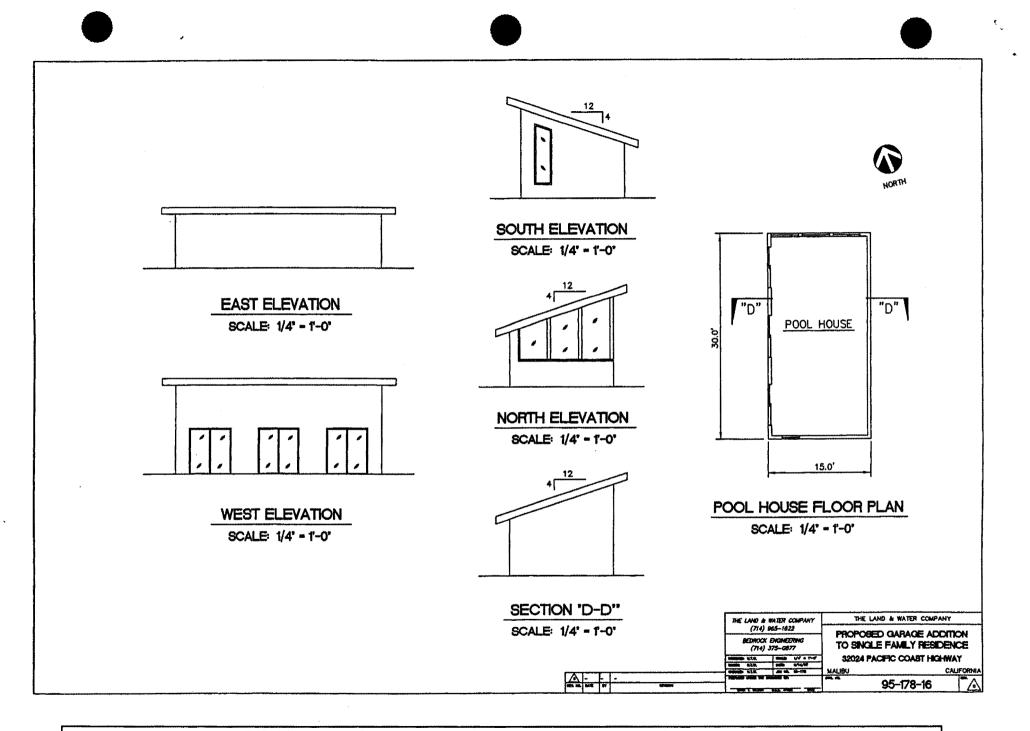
(4-98-098) Floor Plan and Elevations of Pool House
